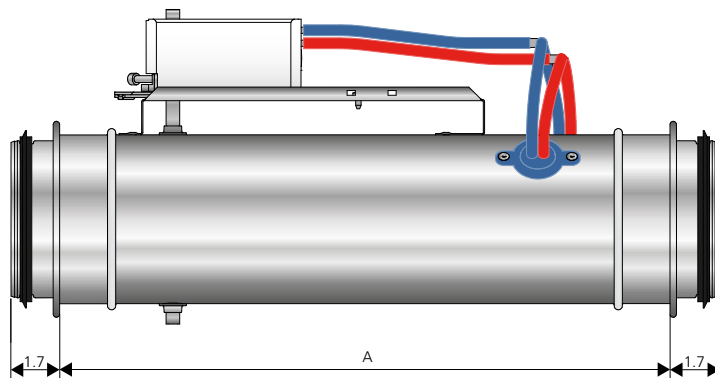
Dimensions with DUCT ADAPTER installed, REACT V SKNX circular.
